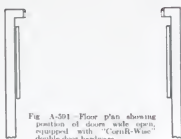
Floor plan showing position of doors wide open, equipped with "CornR-Wise" double door hardware.
